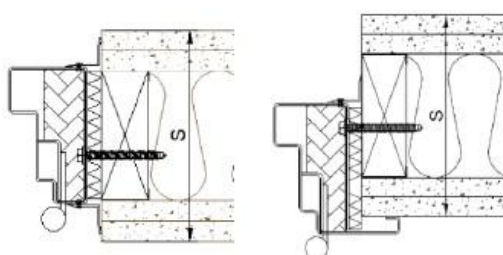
Installation of the door into a lightweight wall (SMU101/201)
